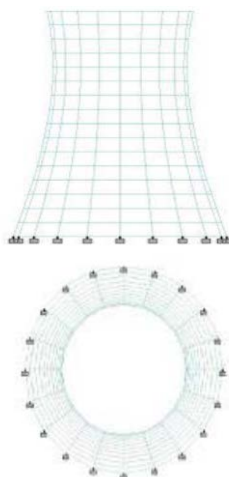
Elevation of cooling tower Fig. 3.2: Plan of cooling tower
